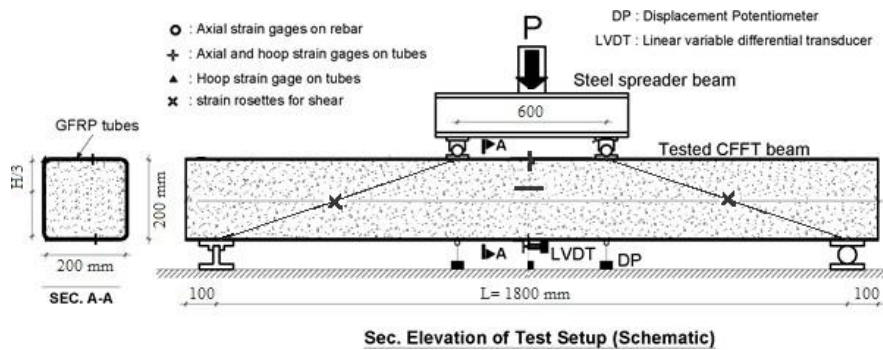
Typical Schematic of Test Setup and Instrumentations (Dimensions are in mm)
